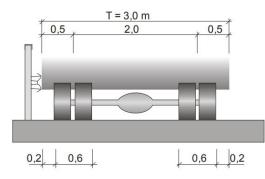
Position of a vehicle sideways next to steel railings without curbs (NPRA 2021c).
